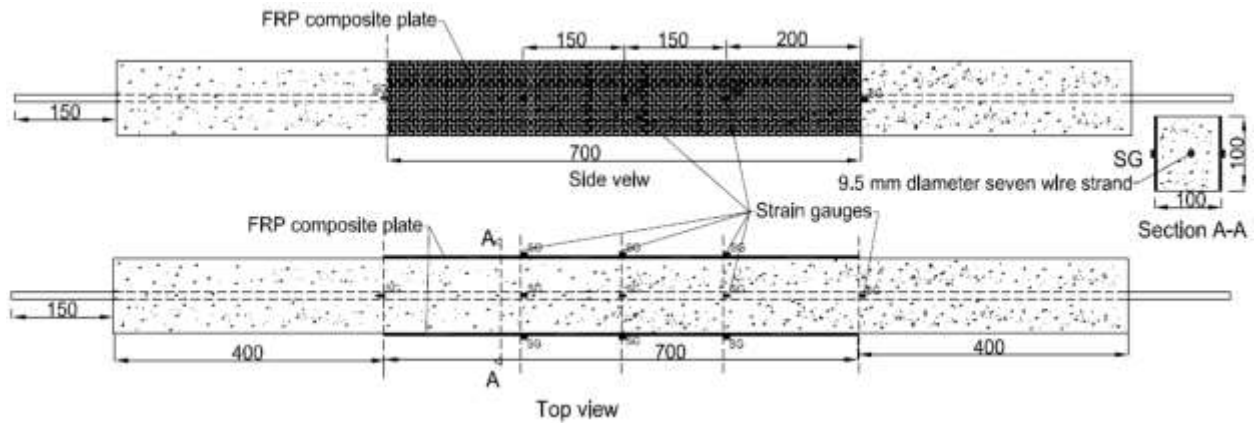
Details of FRP-reinforced prestressed concrete tension specimen
